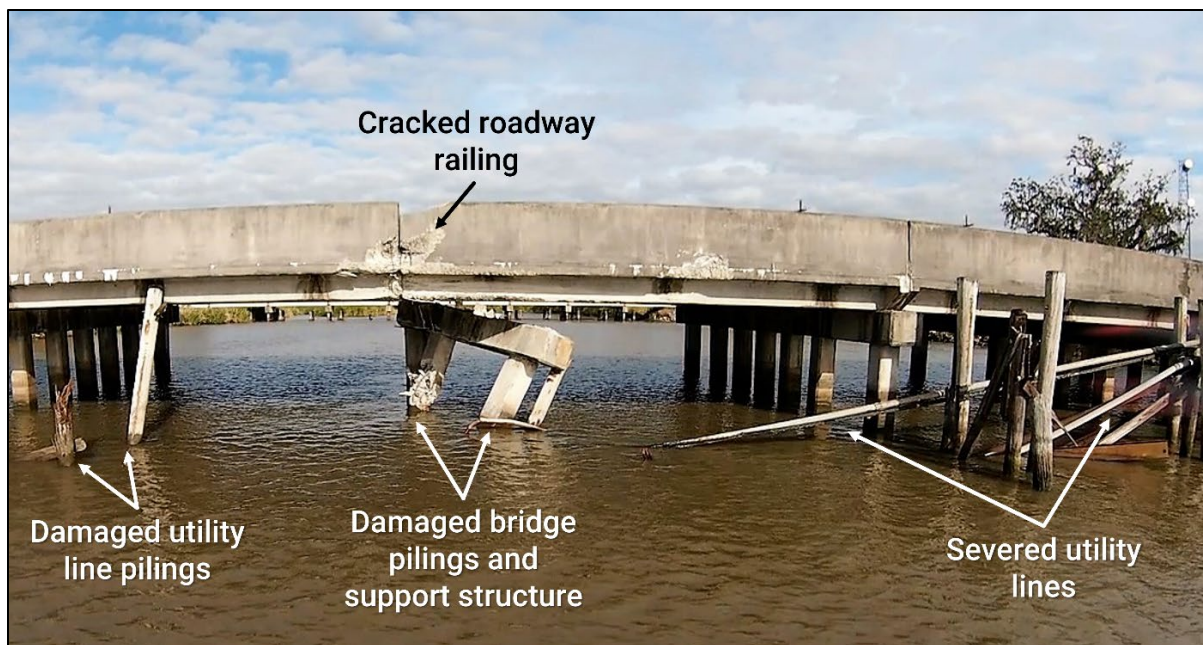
Route 182 bridge damage. (Background source: Cajun Drone Photography, Jim Pierce Jr.)
